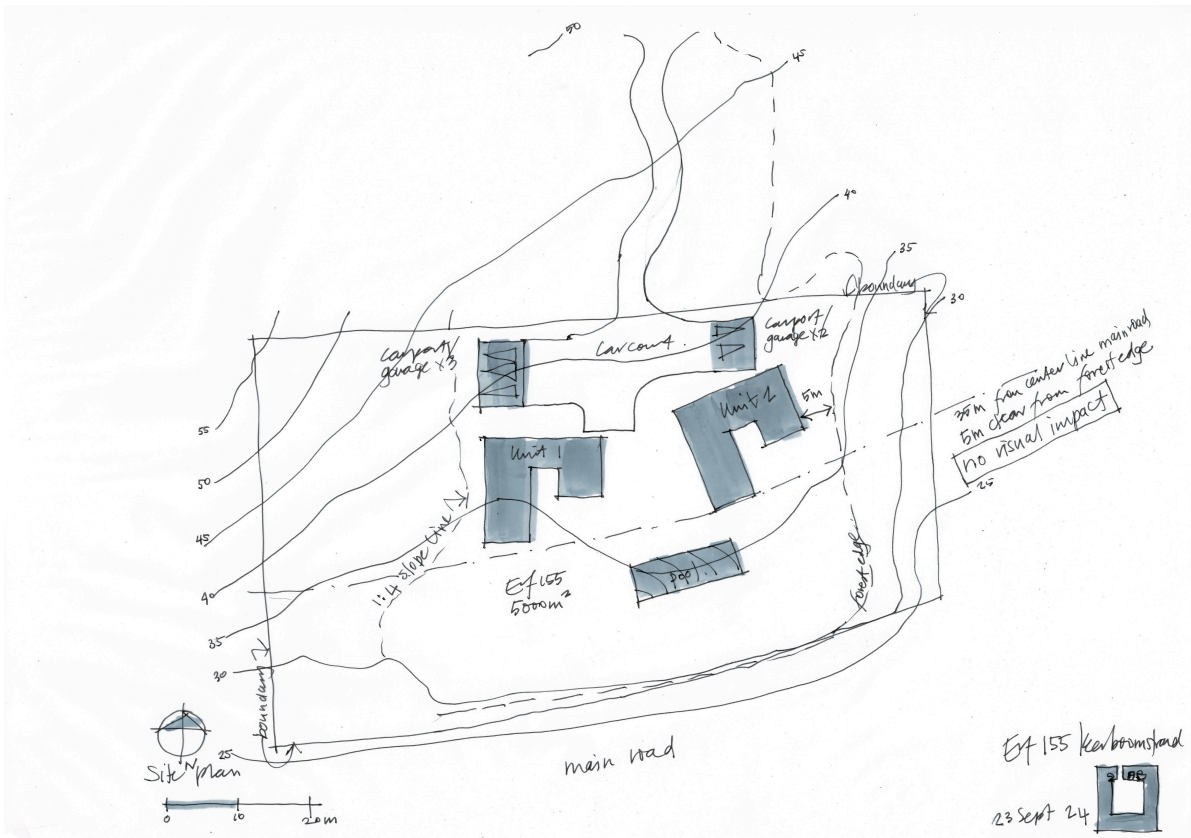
2025 Preferred alternative site plan and section (Slee, 2025)
